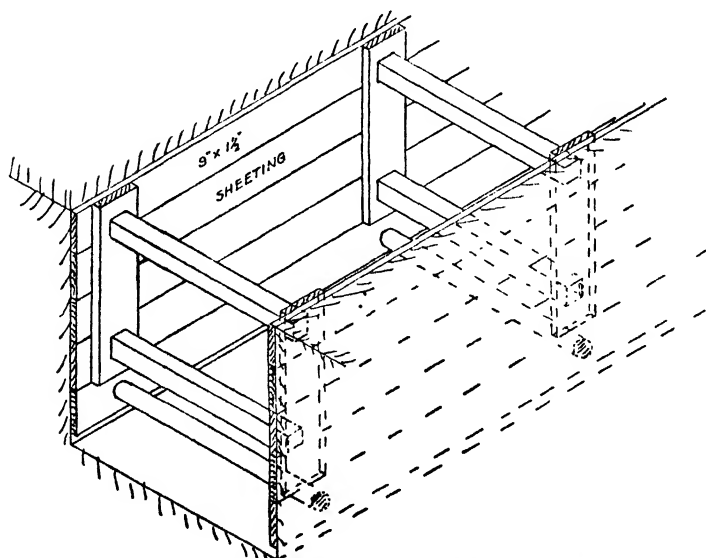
Timbering for Trenches in Dangerous Ground.
